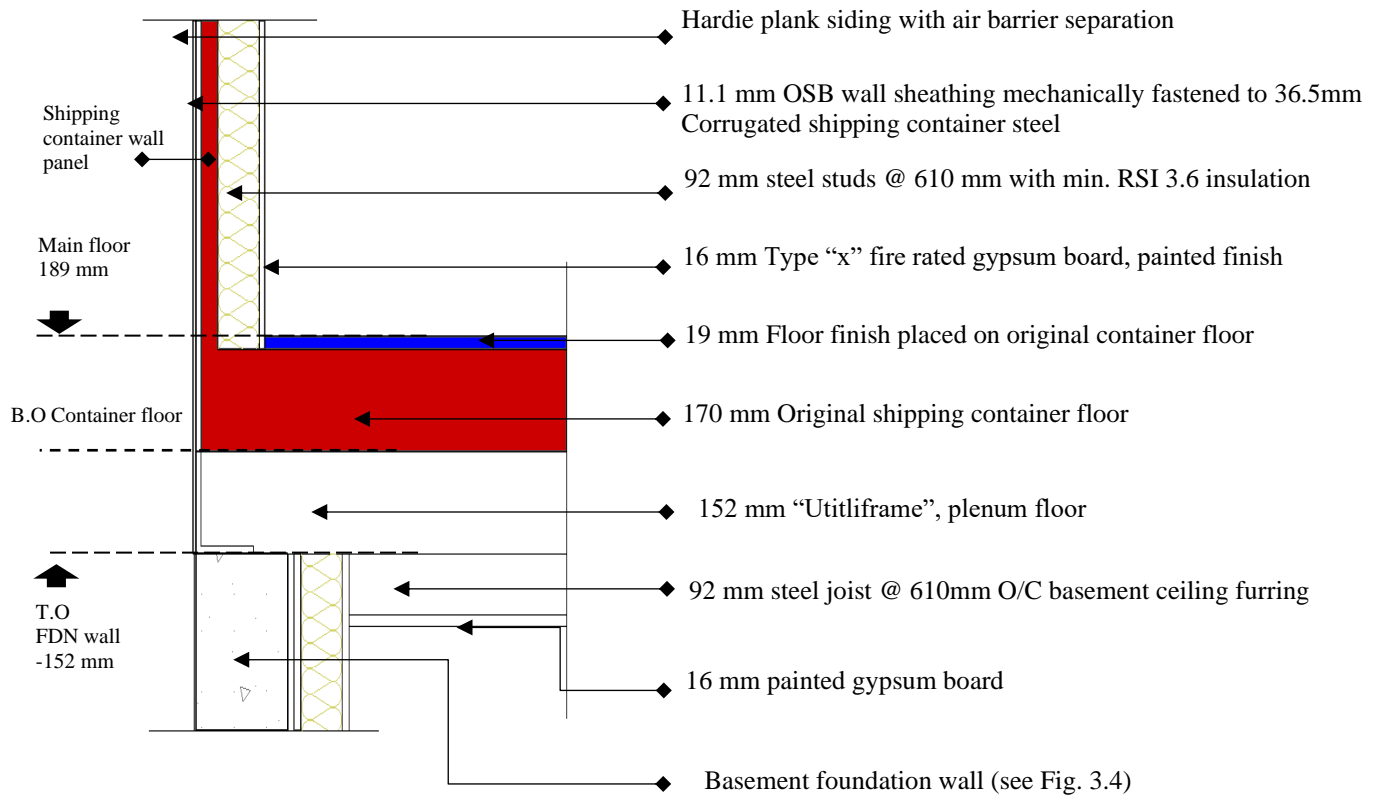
D-04 Basement to Main Floor Connection Detailing Wall and Floor
